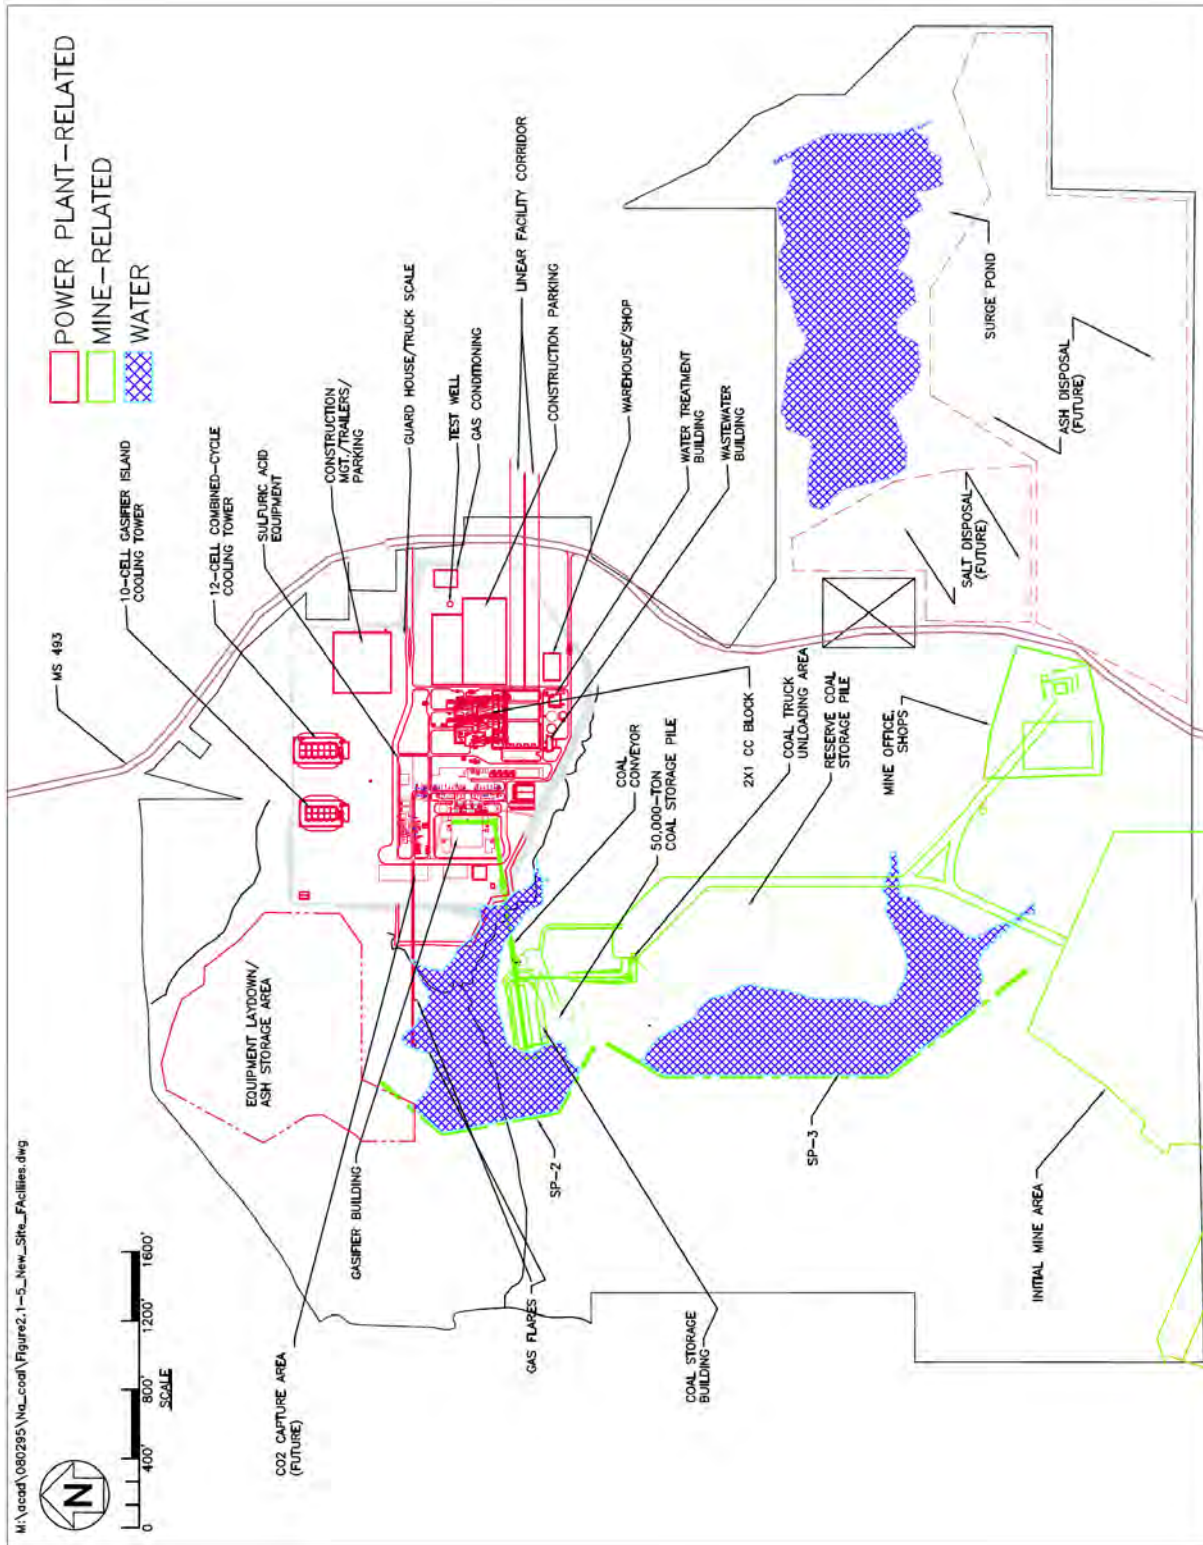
Planned Arrangement of Equipment and Facilities on the Kemper County IGCC Project Site
